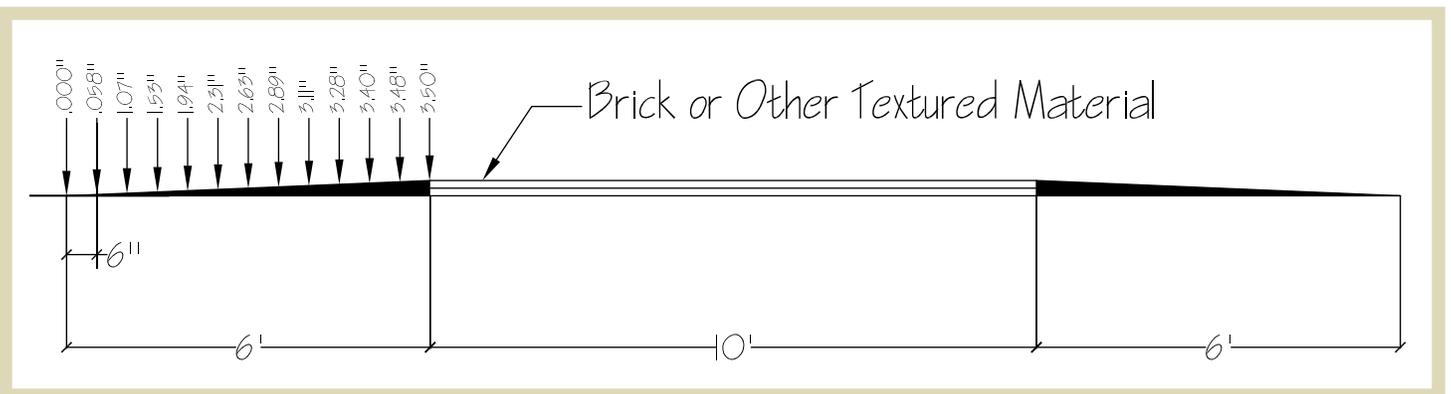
| A raised pedestrian crosswalk in cross section.
